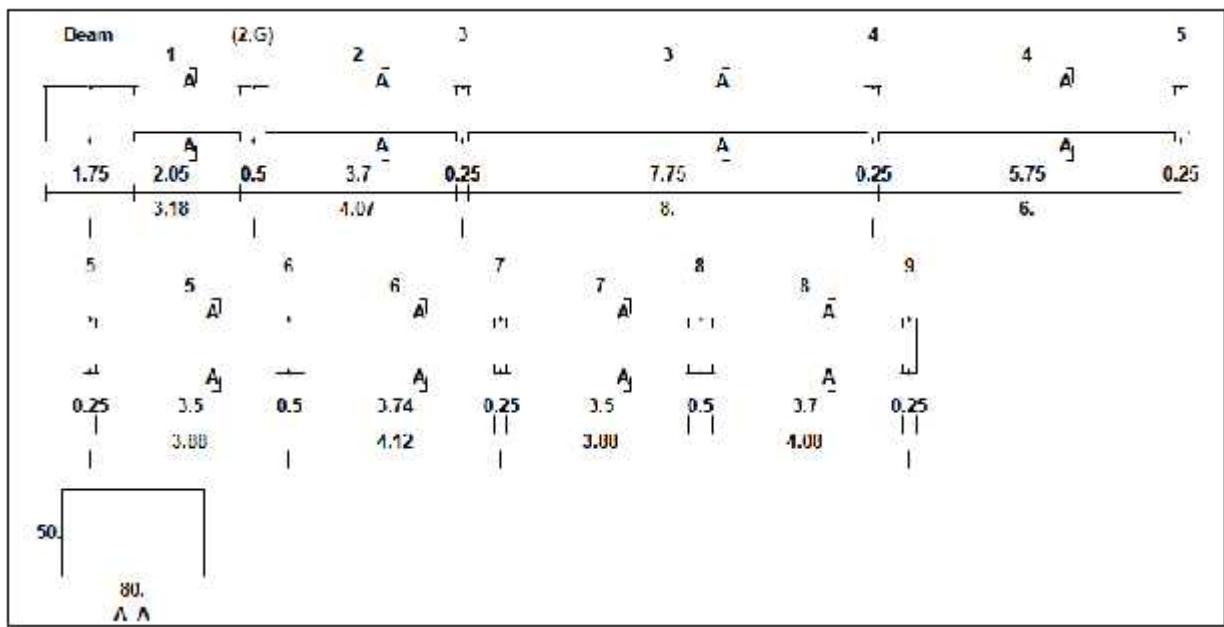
11)Beam Geometry (B2, G) (m)
